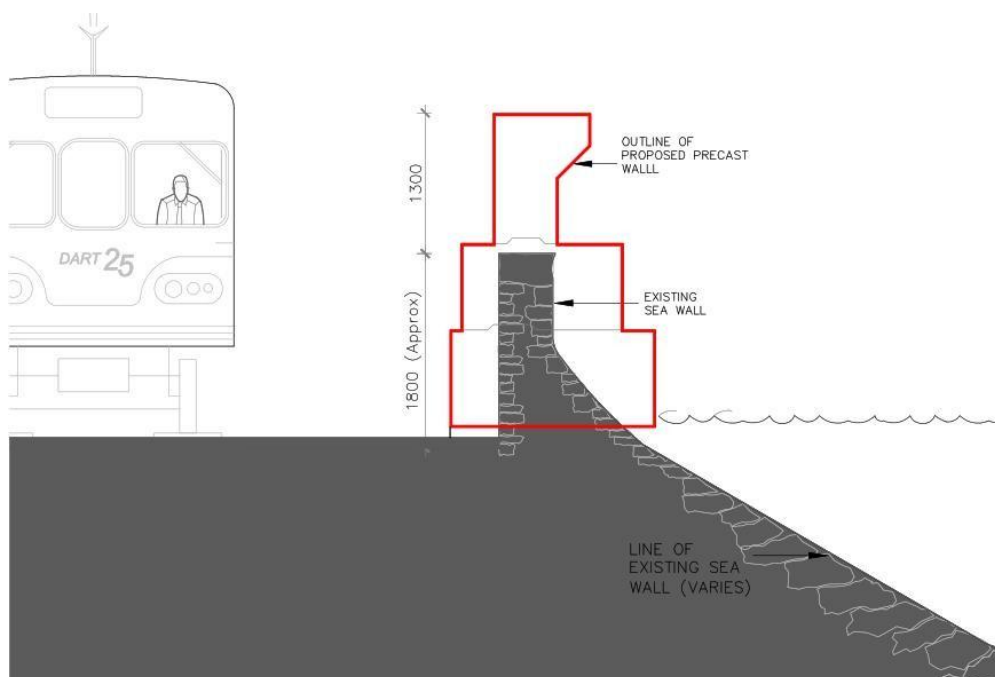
This shows the new proposal in 2025- The Rock Armour is abandoned, the old sea wall demolished down to the level of the tracks and replaced with precast concrete slabs that will be about 1.3m higher than the existing wall making it about 3.0m high overall.
